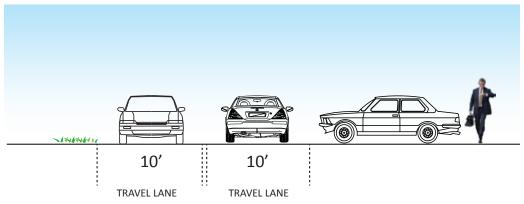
Saugatuck Avenue Cross Section Diagram (looking north)
